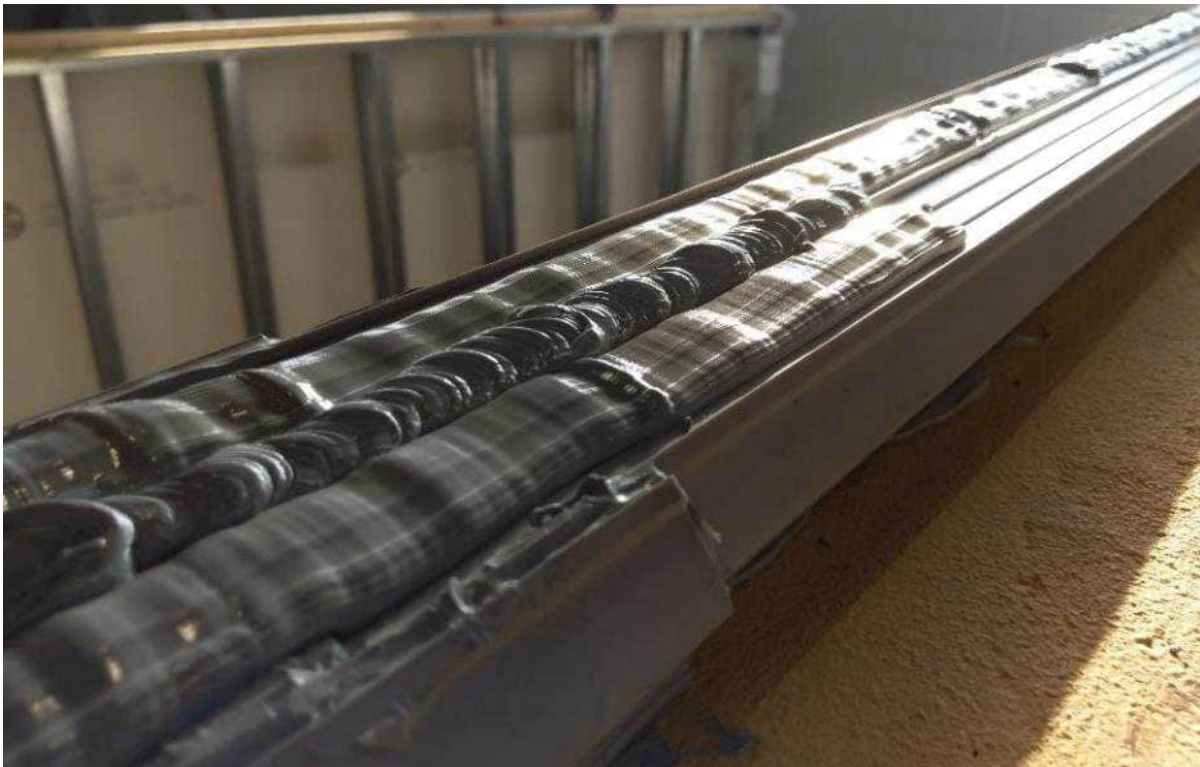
Dow 795 sealant application on top the horizontal panel to panel joint gasket prior to installation of the next panel above
